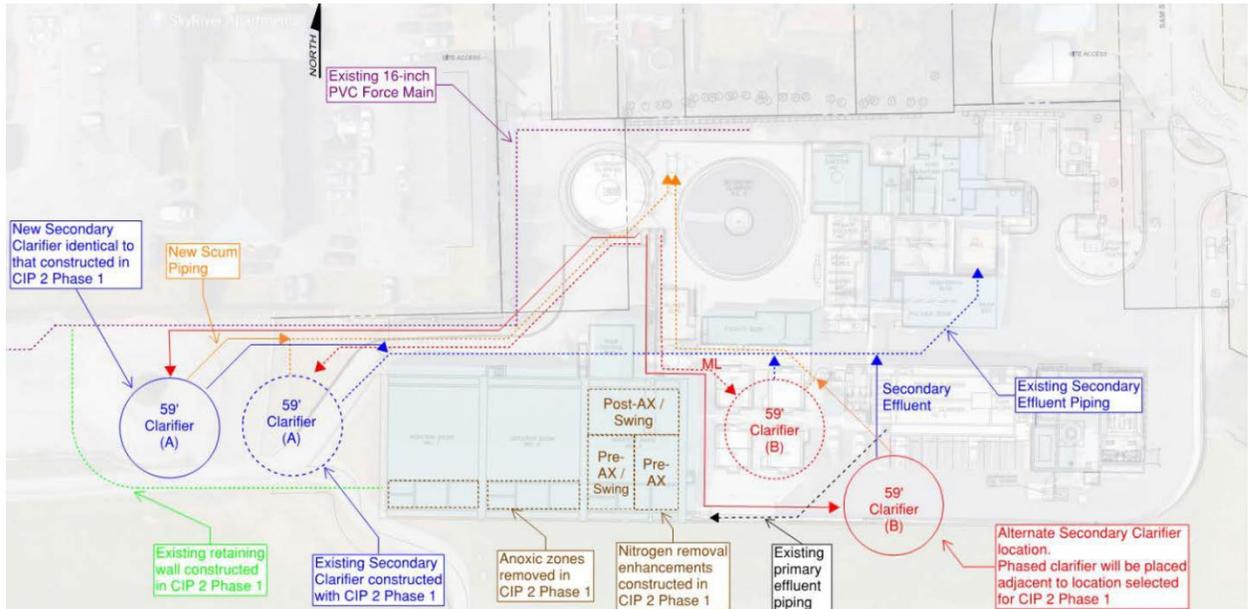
Site Plan for Expanded Conventional Activated Sludge Phase 2 Site Plan
